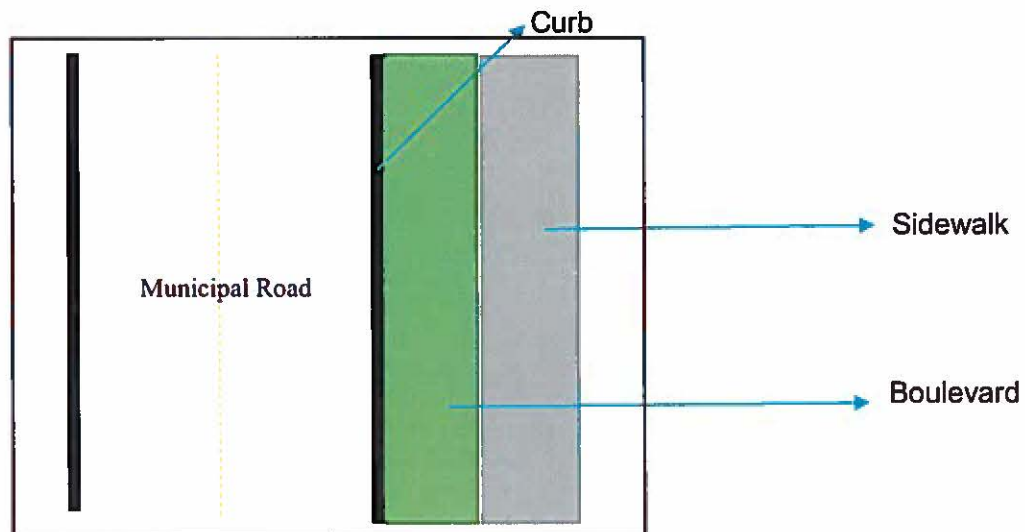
Distinction between Municipal Road, Curb, Boulevard and Sidewalk
